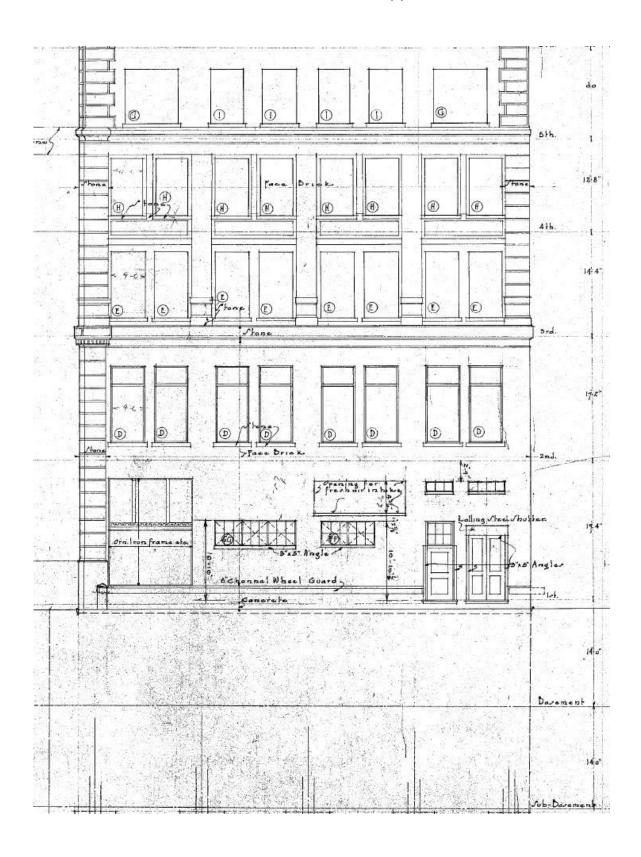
Historic Drawing, Book Tower, Alley Façade, 1925
